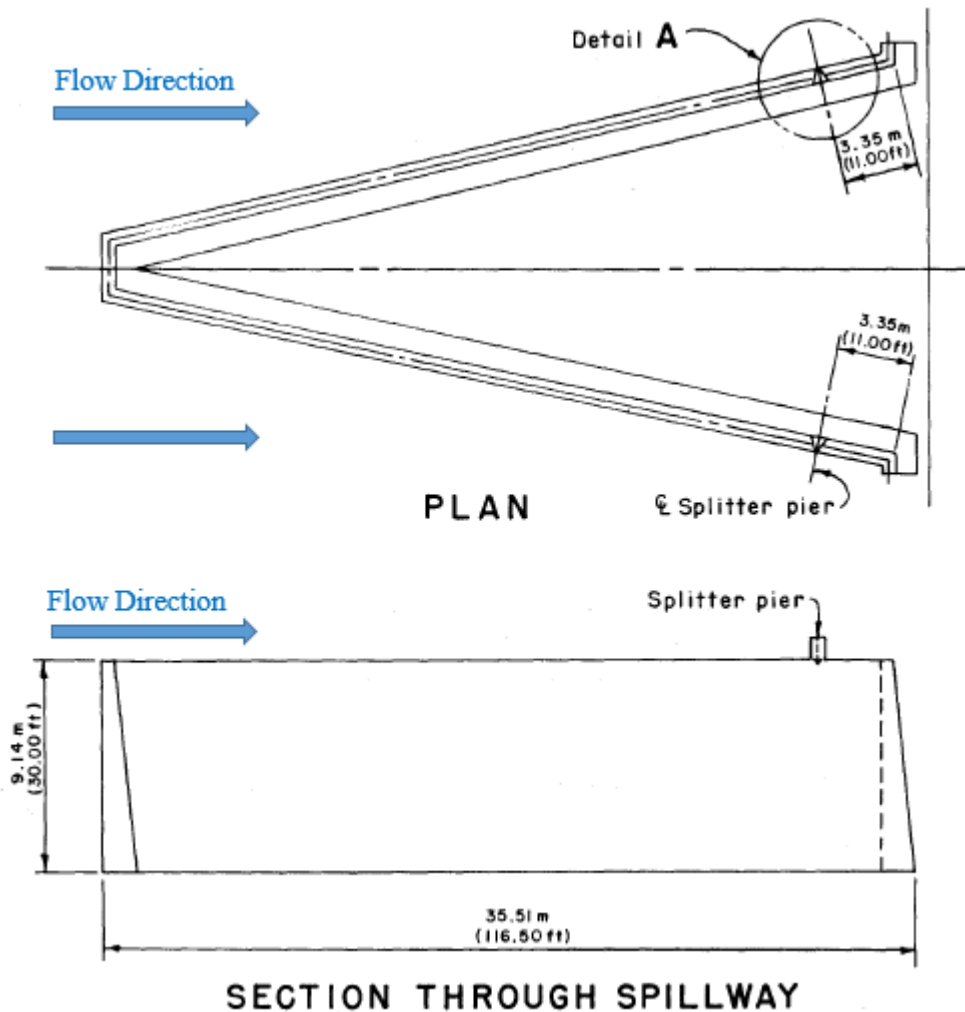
Plan view and view of a section through the labyrinth weir indicating the proposed positioning of the splitter piers (Houston, 1982)
